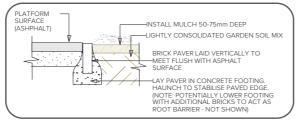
Example of brick edge detail for the garden beds at Lawson Station. Source: Woodside Plants & Design, 2018.
